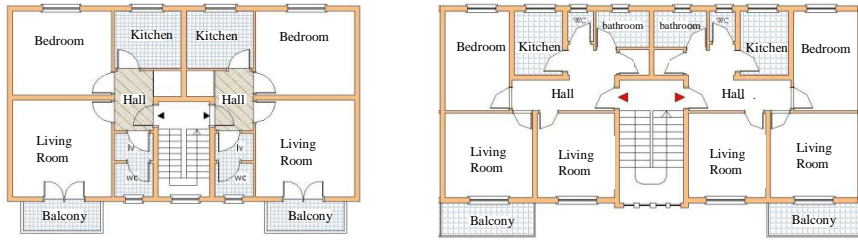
Sumerbank Outer Duty Lodging Building Plan and Sahabiye Municipality Lodging Building B Type Building Plan (Özdin, 2009)
